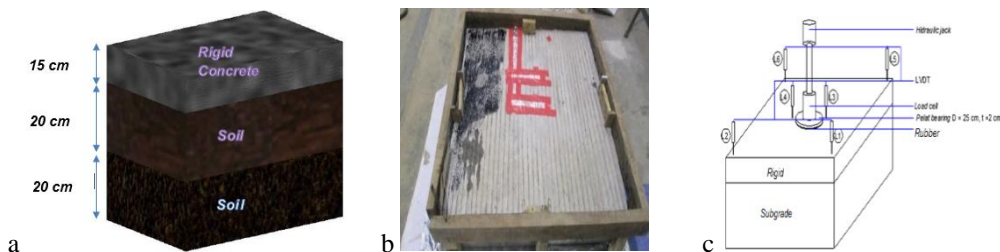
(a) Sketch of the specimen; (b) Specimen of rigid pavement; (c) Sketch of specimen on test apparatus
